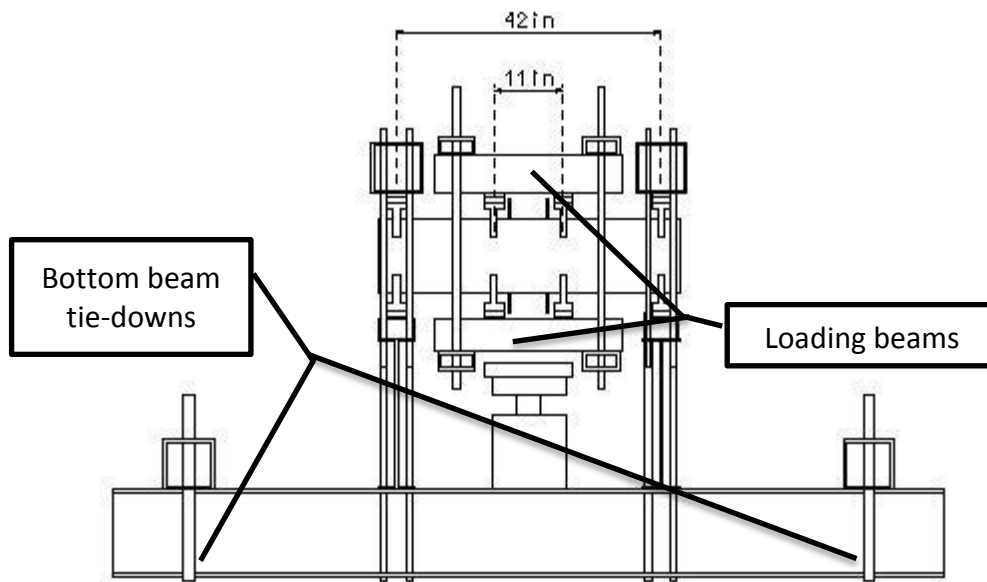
Frame Cutaway Showing Test Specimen Setup
